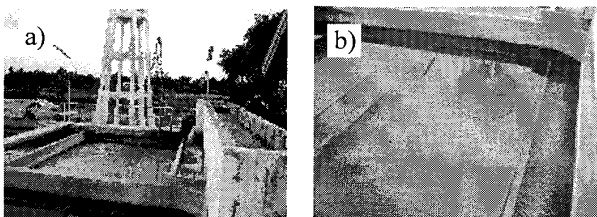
Rapid filtration system, a) Rapid mixing pond, b) Sedimentation pond
